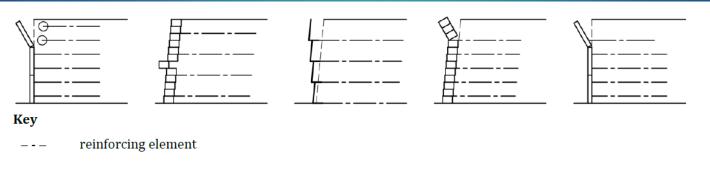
Examples of ultimate limit states for reinforced fill structures involving internal failure mechanisms: (a) connection rupture, (b) shear failure between face elements (bulging), (c) shear failure between facing elements and reinforcing elements, (d) toppling of top facing elements not connected to reinforcing elements and (e) rotation of large facing elements connected to reinforcing elements at one elevation only
